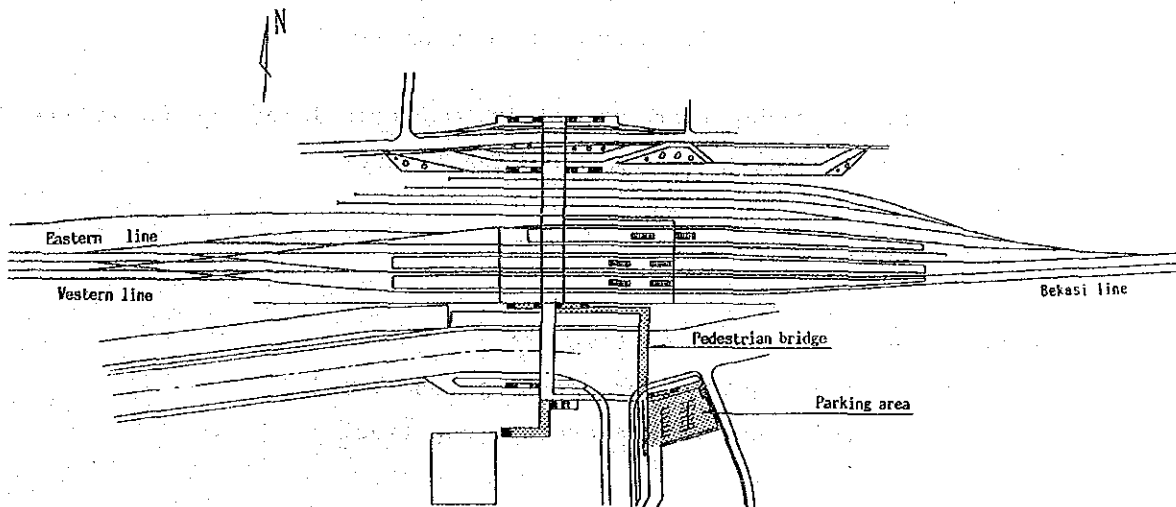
Jatinegara Development Plan (Second Stage)
